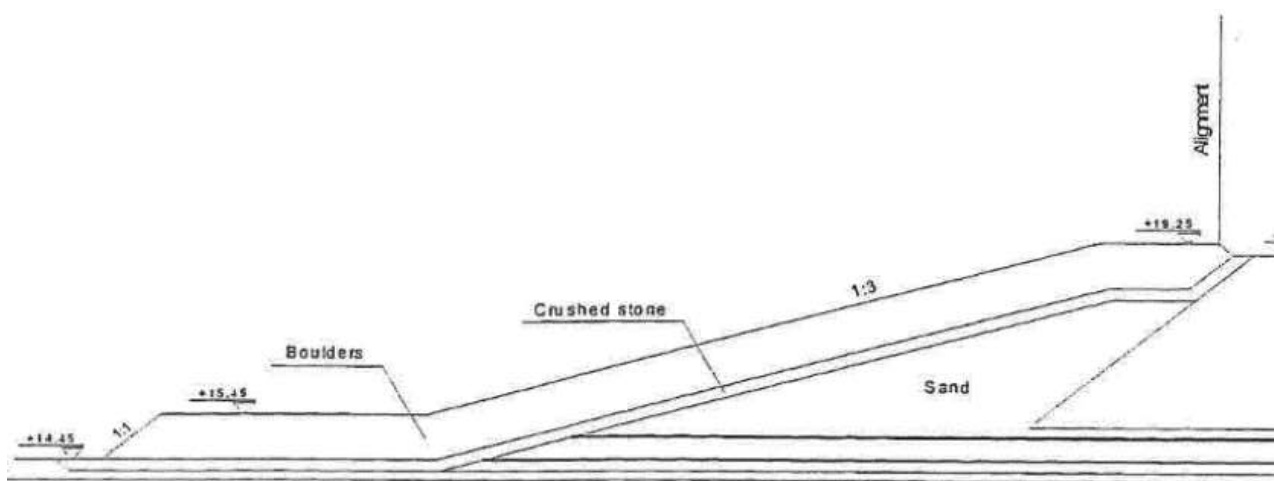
Typical section of a riprap standard design revetment (Guyana Sea Defences)
